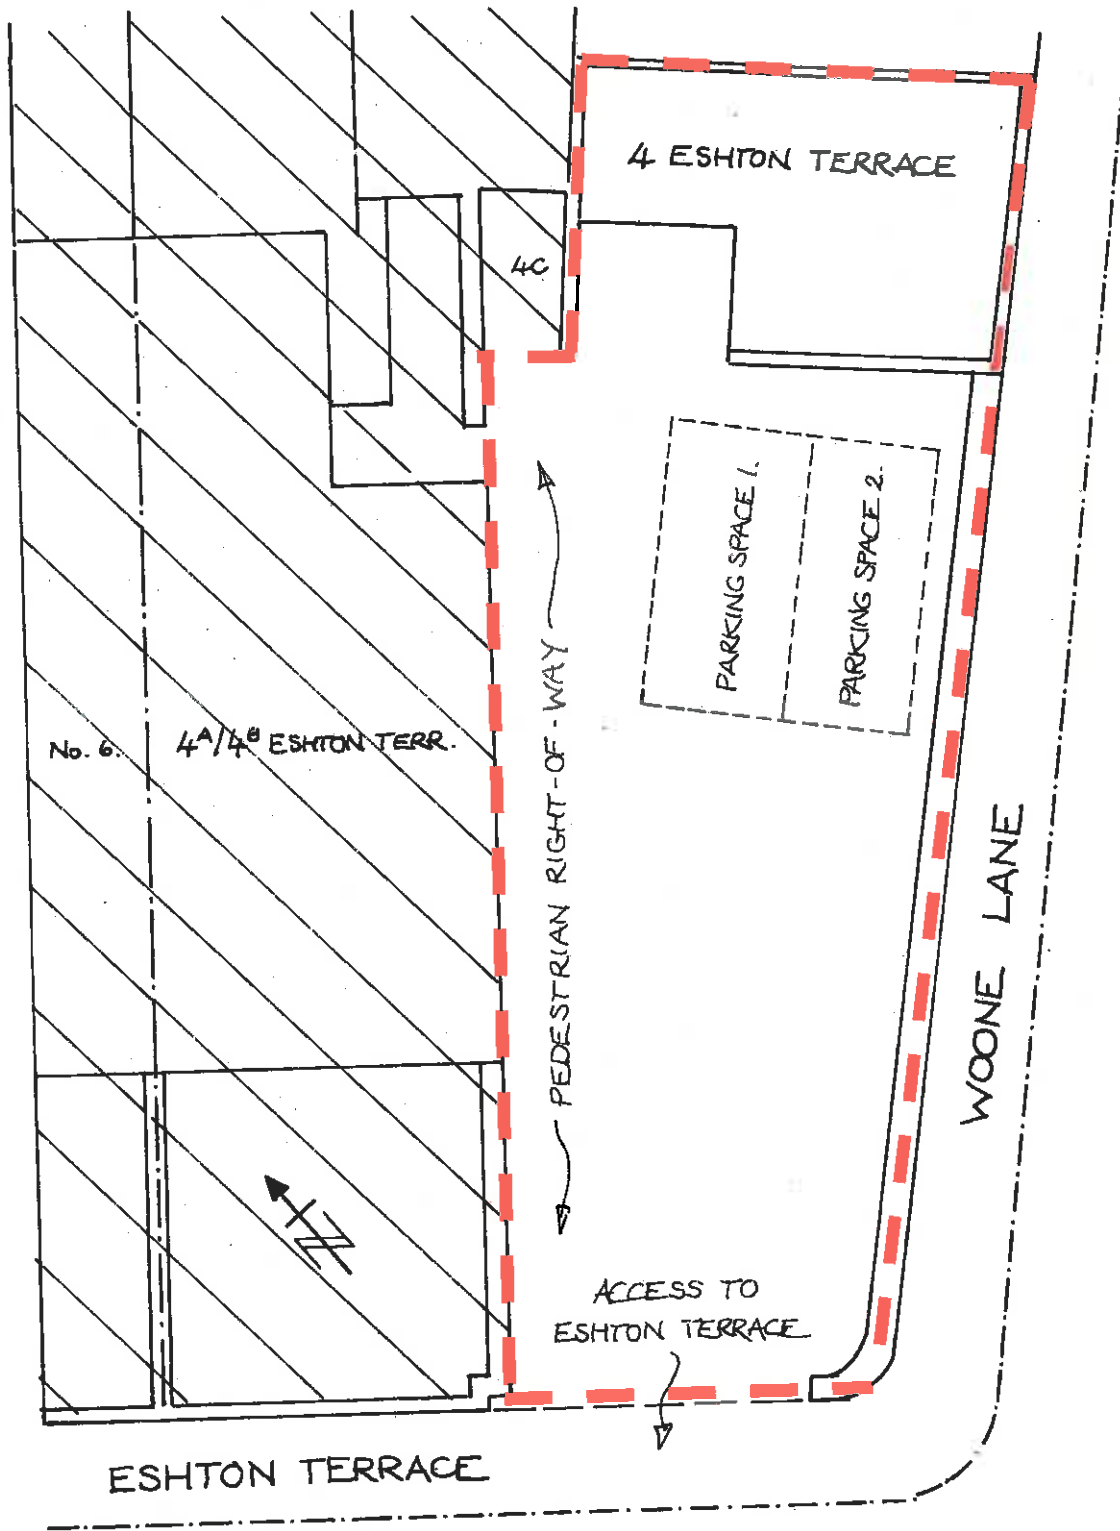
Site Plan of proposed Studio with parking and access (property outlined in red)
